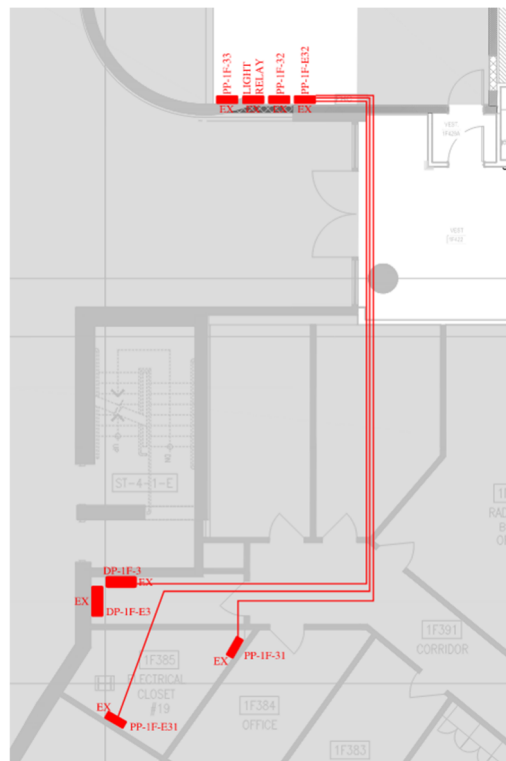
Proposed conduits run for PP-1F-32, PP-1F-33 & PP-1F-E32
